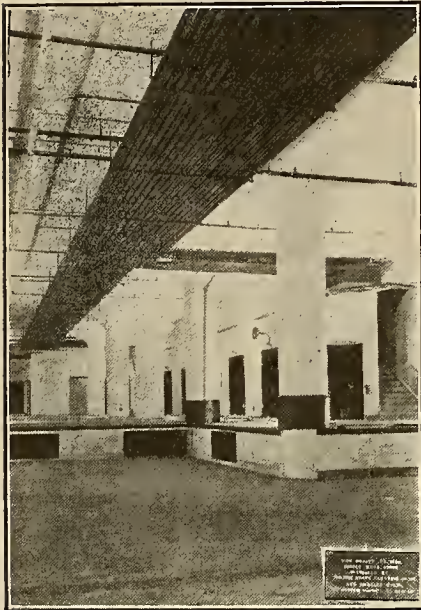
A practical method of suspending conduit runs from the ceiling.
